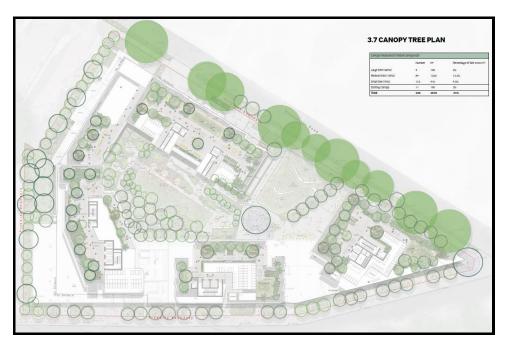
Proposed Tree Canopy Plan (Source: RPS, Drawing No DA22 dated 10 March 2023)
